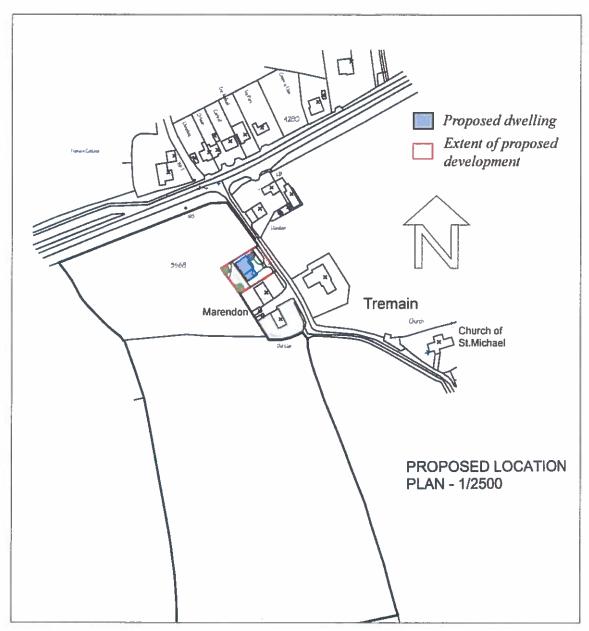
Site plan showing position of proposed development wiyhin village of Tremain.
